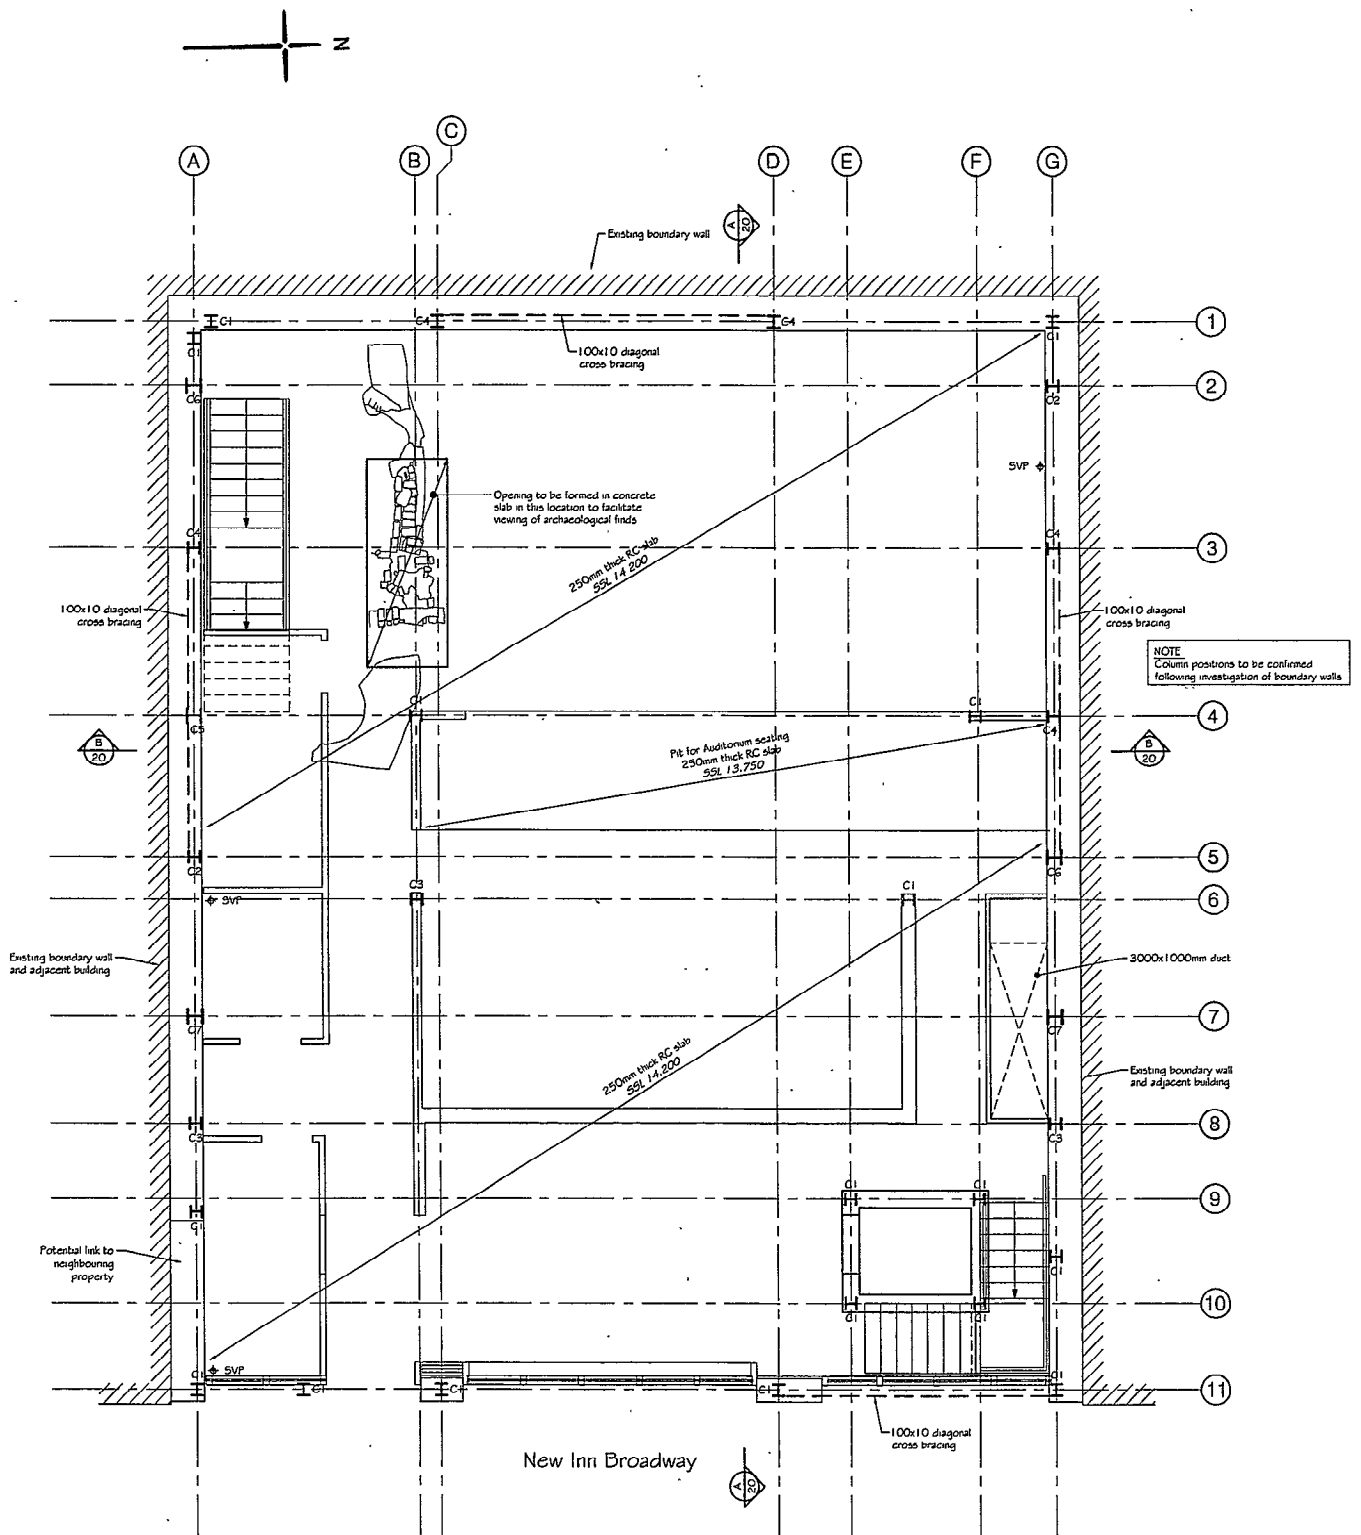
Preliminary ground floor layout (showing viewing chamber) (Hannah Reed drawing no. C-208223/02 Rev P5, 19/05/09)
